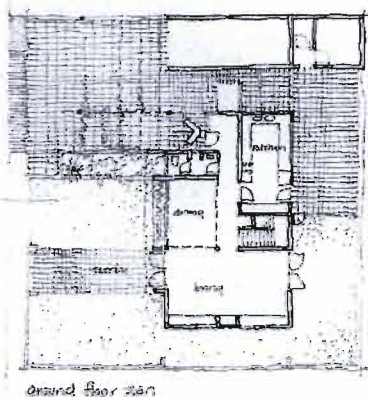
B.Lee - House Goga 1967. Plans drawn by D.Jordaan.
